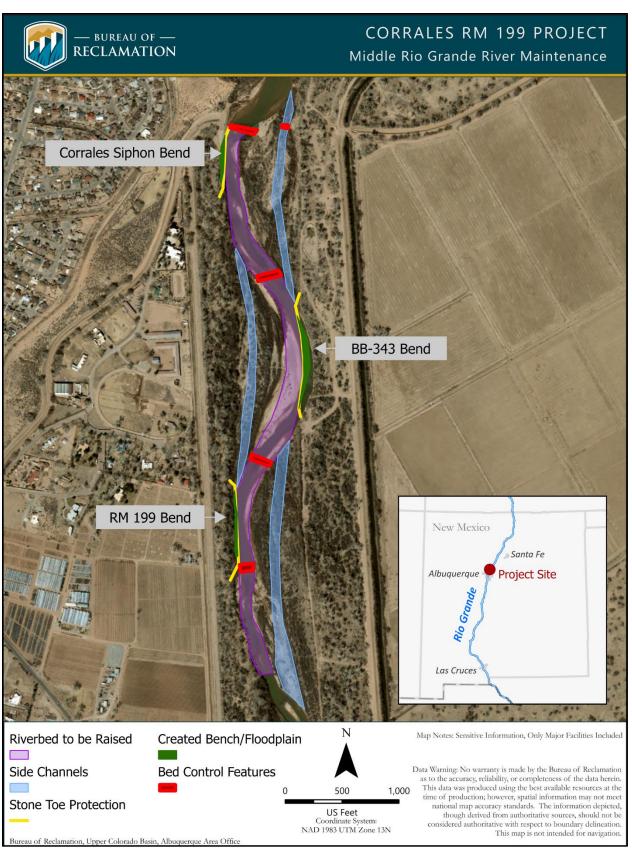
Plan view showing the design layout of the RM 199 maintenance project.
